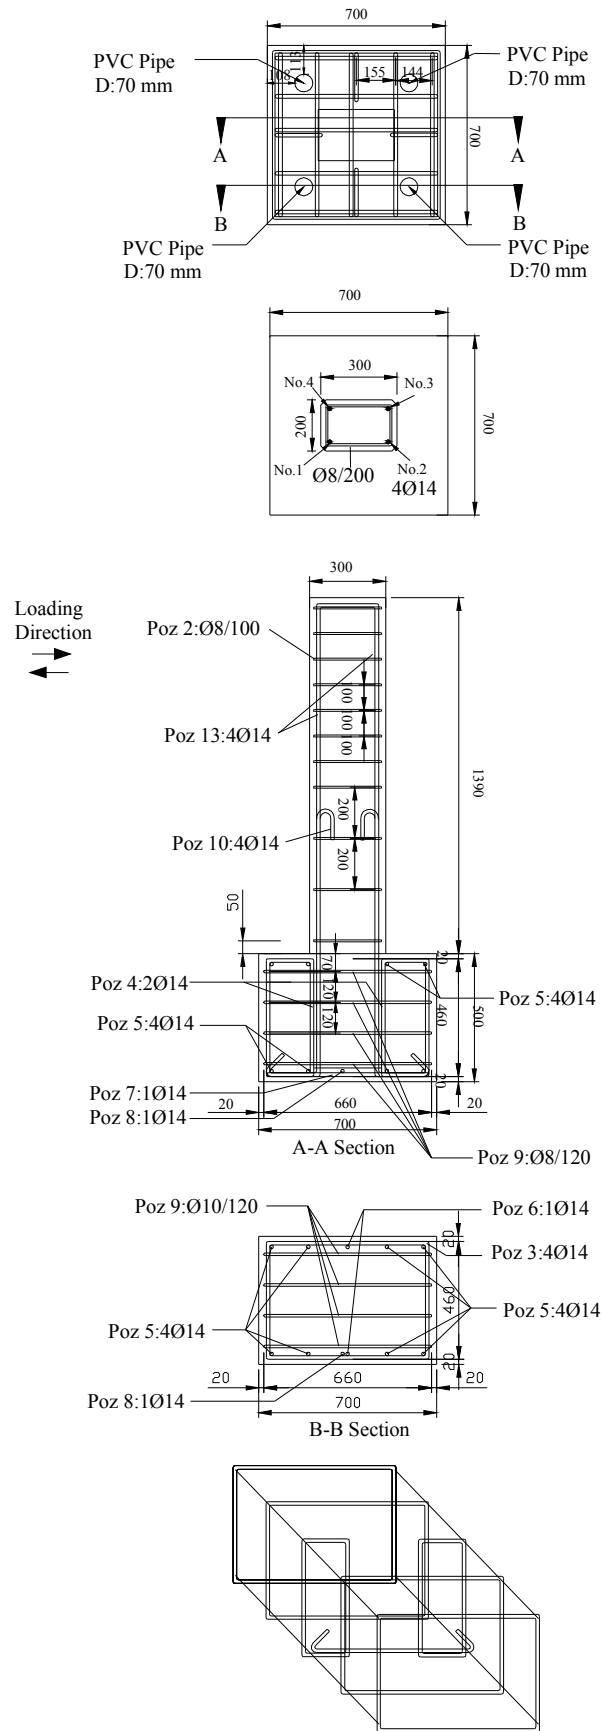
Reinforcing cage of the third type specimens (south side).
